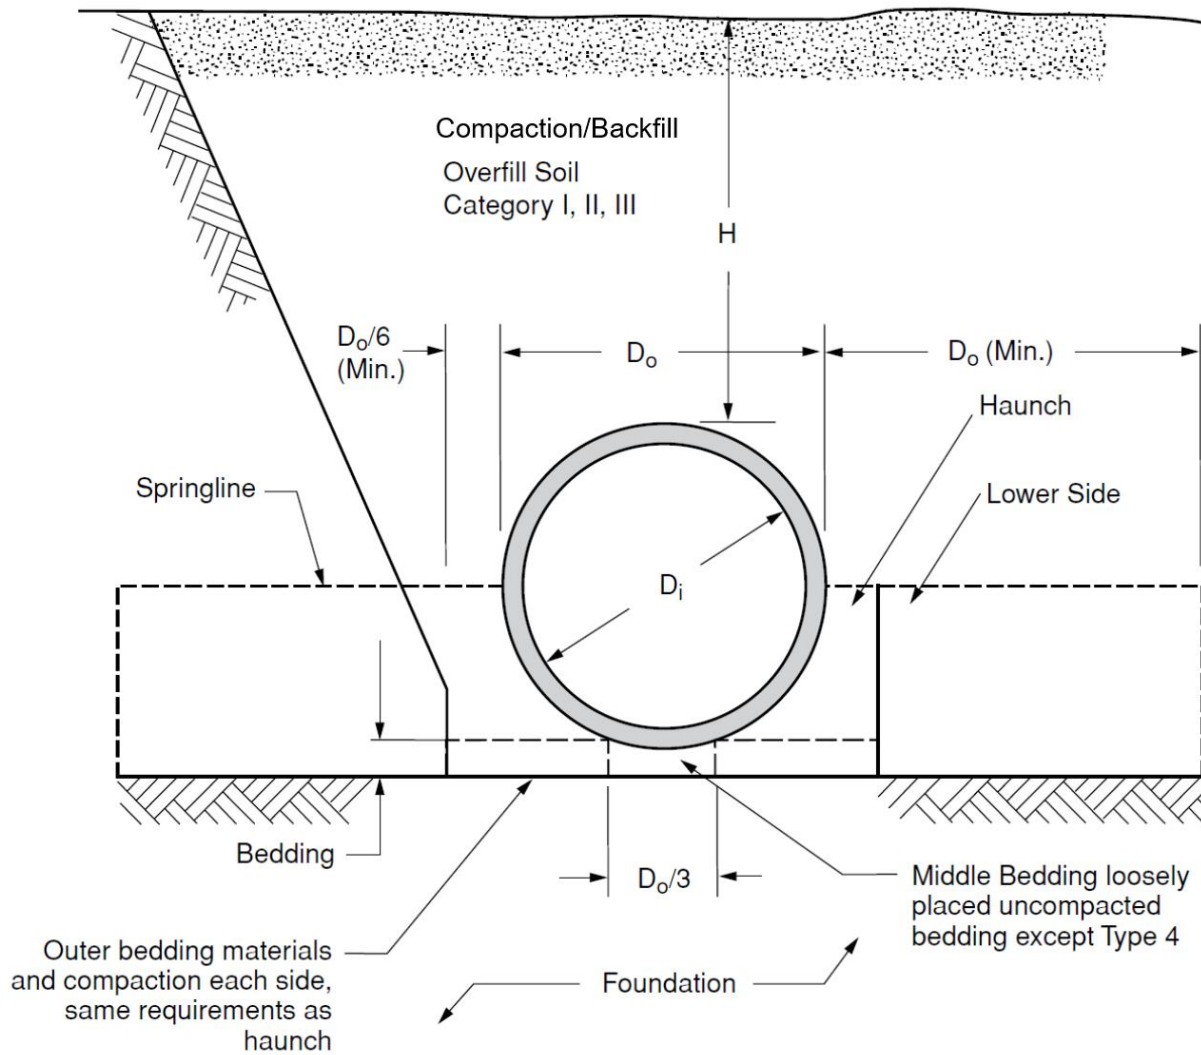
Pipe Installation Terminology (ACPA, 2011, pp 31)
